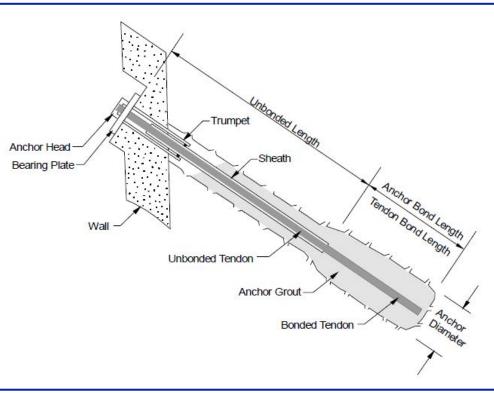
Typical components of a tieback anchor (FHWA, 1999)
